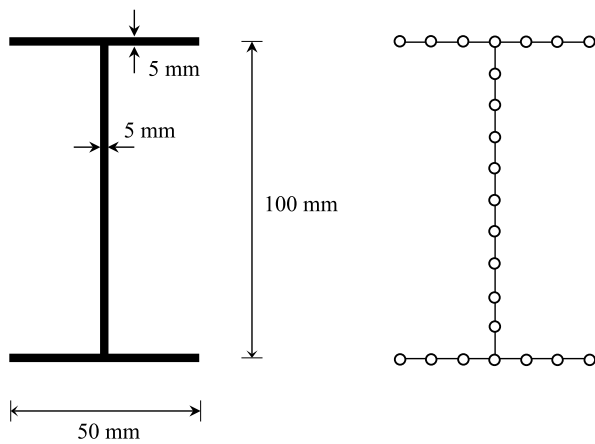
Ex. 4 – Beam and column cross-section and the discretisation.
